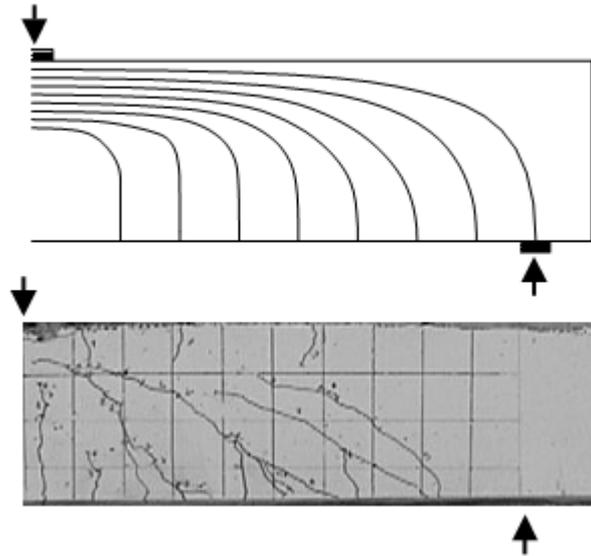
Principal compressive stress trajectories in an uncracked beam and photograph of a cracked reinforced concrete beam.
